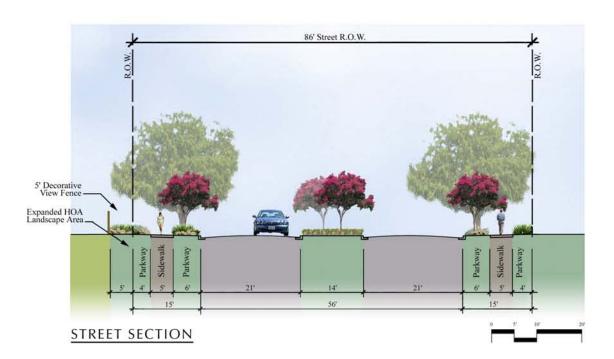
, *Primary Entry Road Streetscape – Menifee Road*, incorporates an 86-foot right-of-way condition and includes streetscape improvements such as a 5-foot non-contiguous sidewalk, a 6-foot landscape parkway, a 4-foot landscape transition zone that is adjacent to low-density residential lots, and a 10-foot landscaped median. Large-scale street trees provide a "shade-lined avenue" effect, with flowering trees in the median for variety and accent. Spacing of street trees comply with County standards and are regularly spaced to signify the entry zone to the community.
